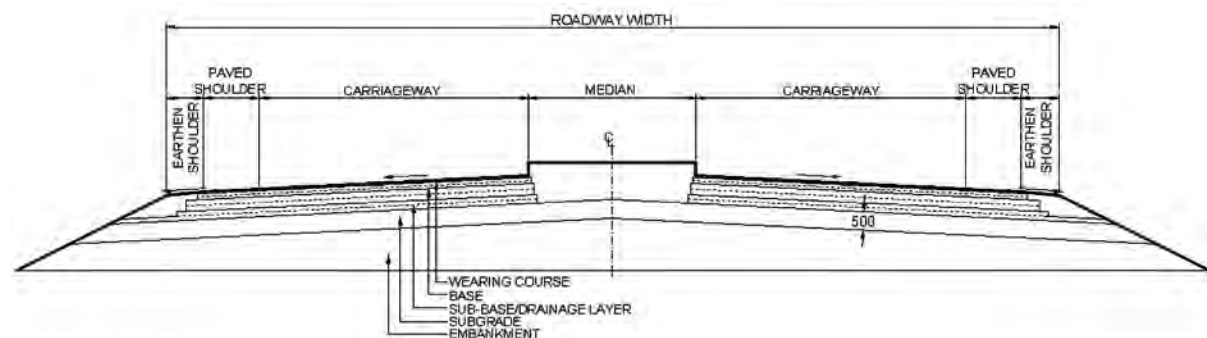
Terms Used in the Specifications to Describe Road Cross-Section Elements of a Dual Carriageway
